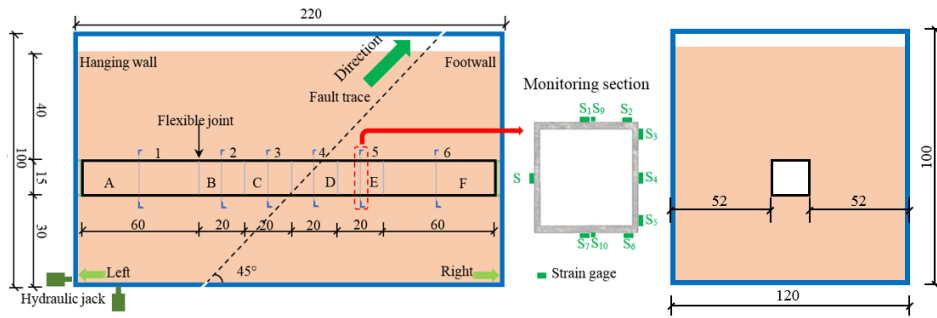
Distribution of monitoring section and sectional tunnel lining (Unit: cm).
